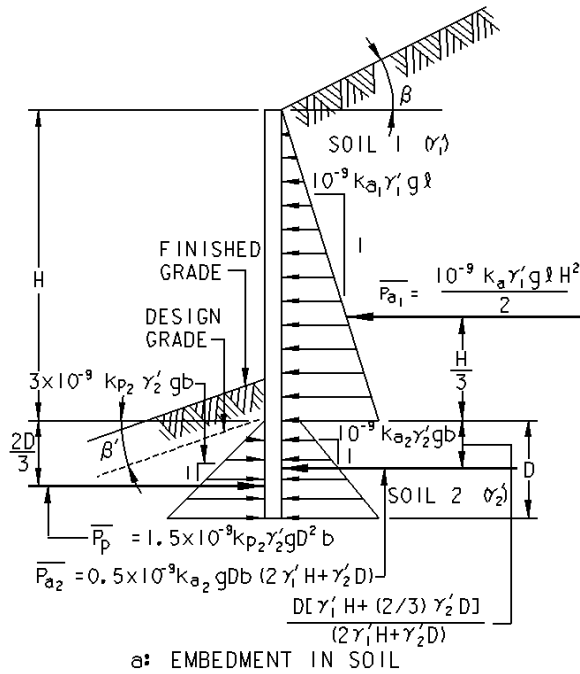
Simplified Earth Pressure Distributions for Permanent Nongravity Cantilevered Walls with Discrete Vertical Wall Elements
